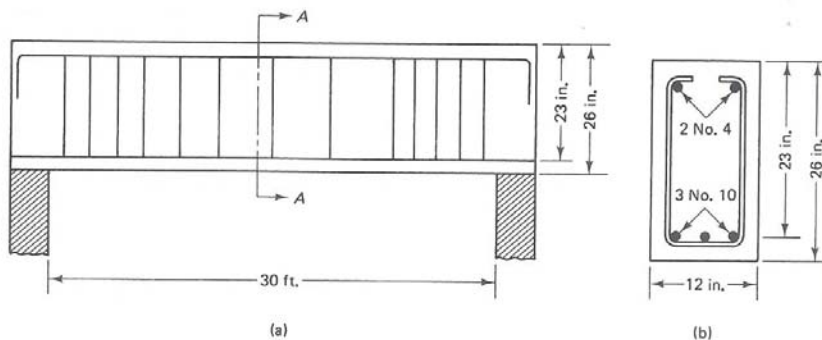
Details of Reinforcement: (a) section elevation (b) midspan section
